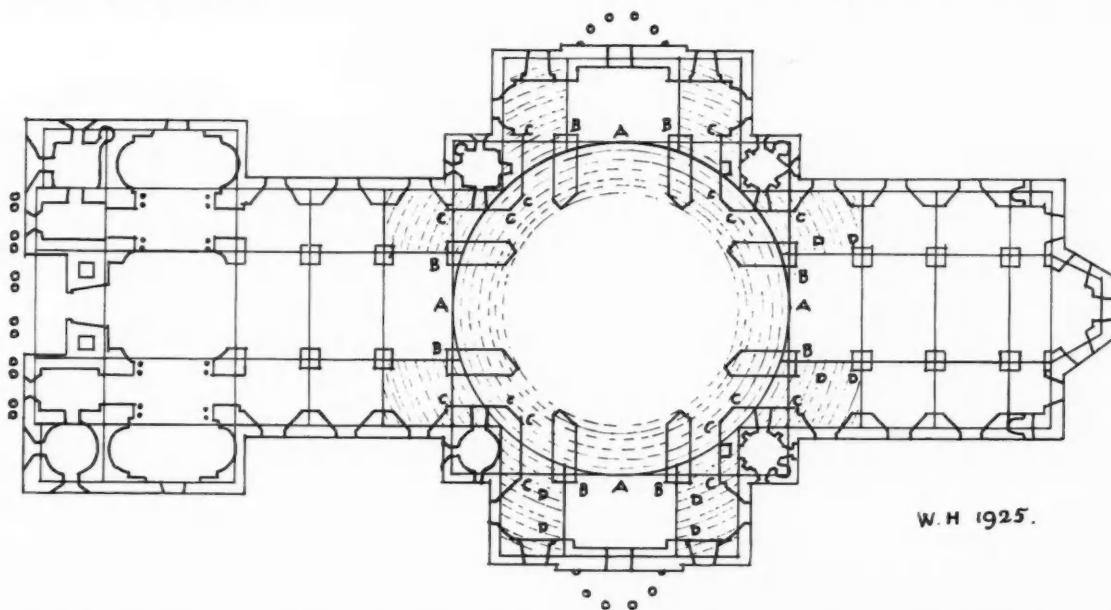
Suggested main lines of reinforcement to be buried in concrete beams in the wall tops; and plan of reinforced concrete truncated cone to underpin the outer and inner drums and spread their weight over the surrounding masses of masonry. None of these measures will interfere with either the external or internal appearance of the building.
